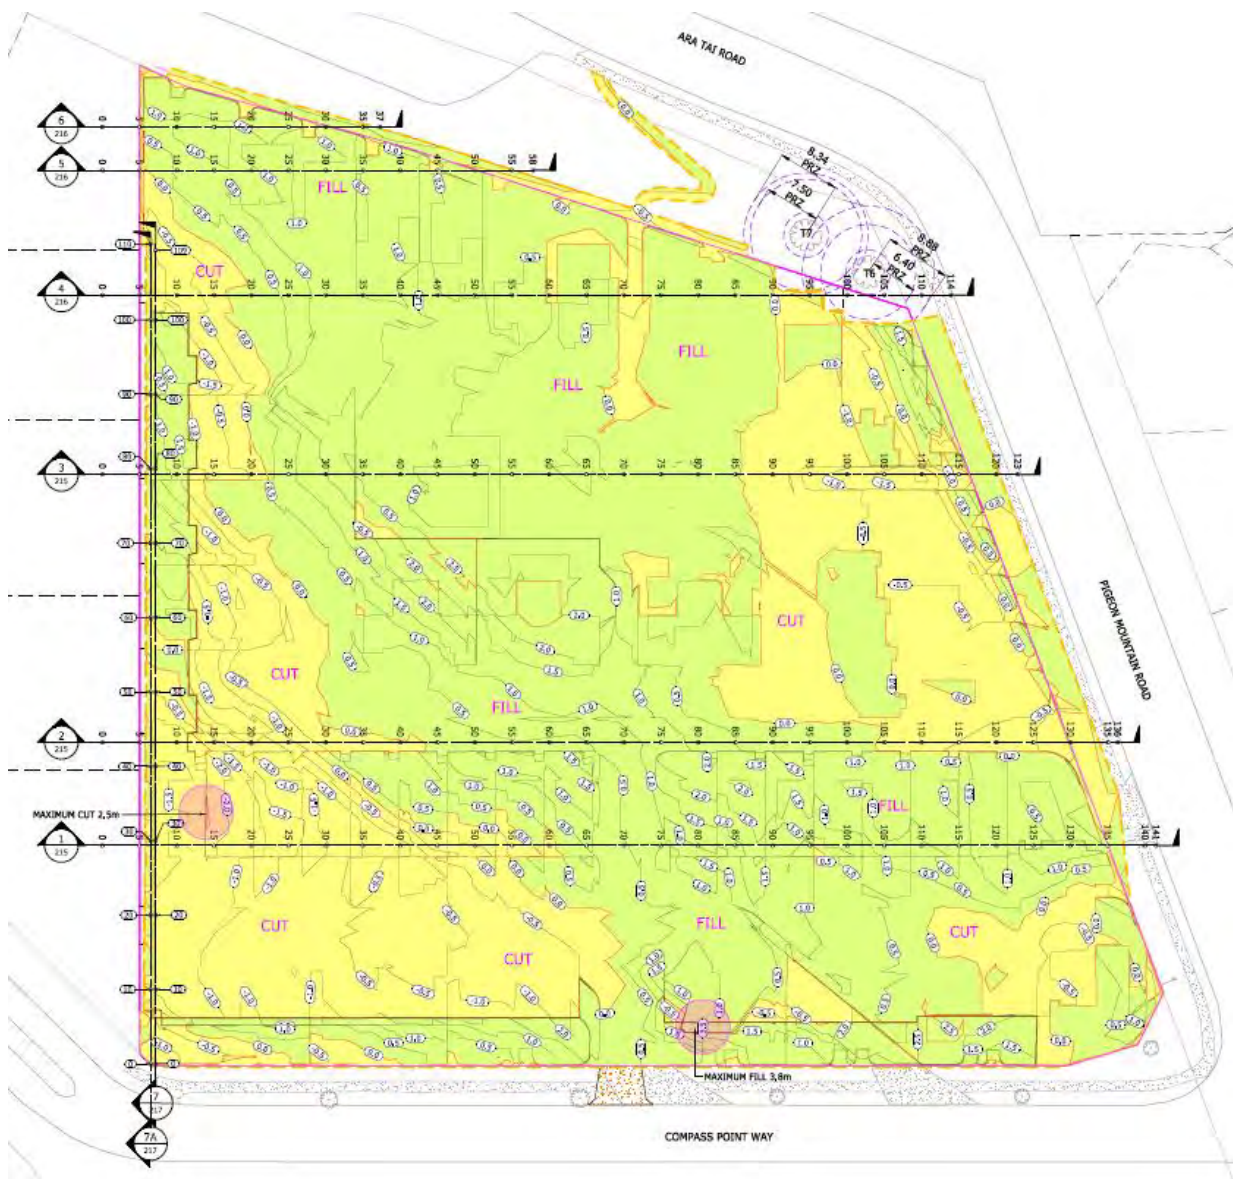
Cut to Fill Drawing (Source: Eighty6 Engineering)
